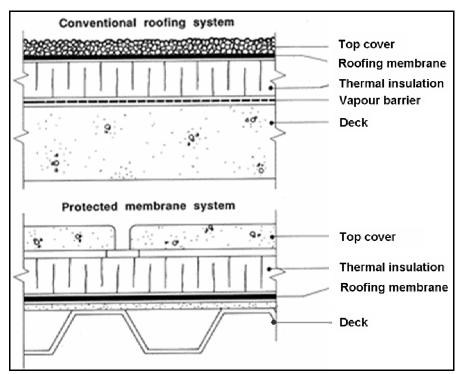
General cross-section of a conventional (top) and protected membrane (bottom) roof assembly (Source: Hedlin, 1989)
